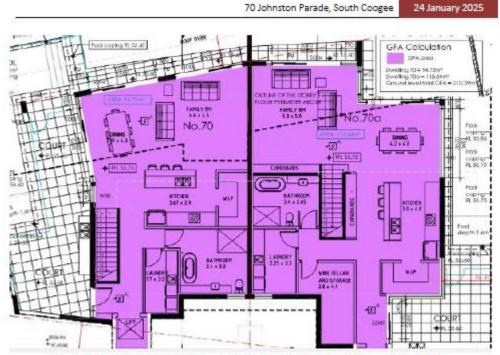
Proposed alterations and additions at Ground Floor, resulting in a gross floor area of 210.39m². Source: Drawing No. DA11 Revision A by Edifice Design.
